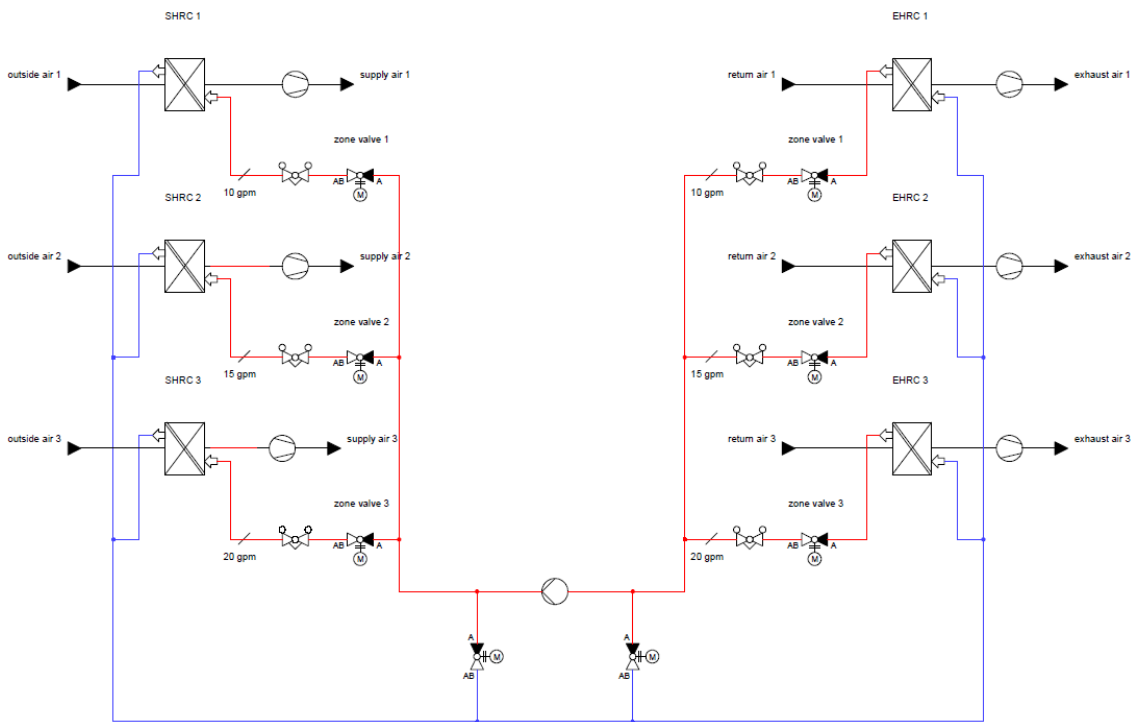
Integrated system with 3 supply air and exhaust air zones
